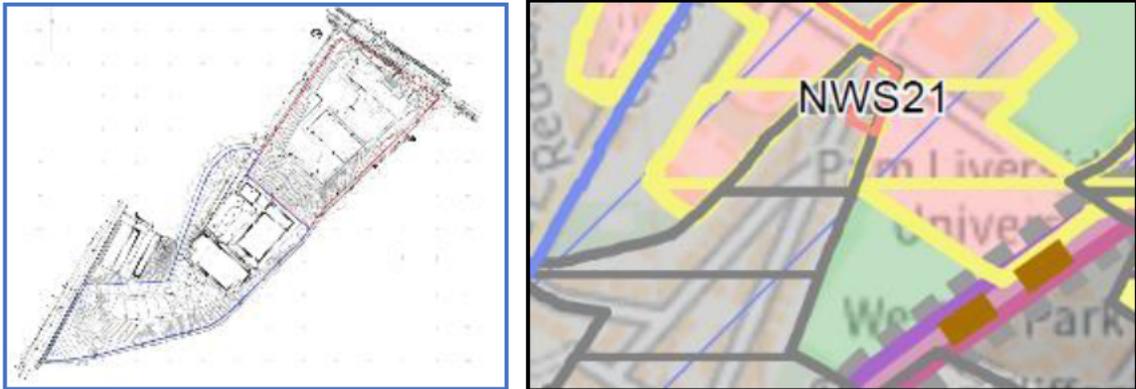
Northumberland Road Car Park Site Location Plan and Policy Designation (Source: Sheffield Southwest Policy Map).
